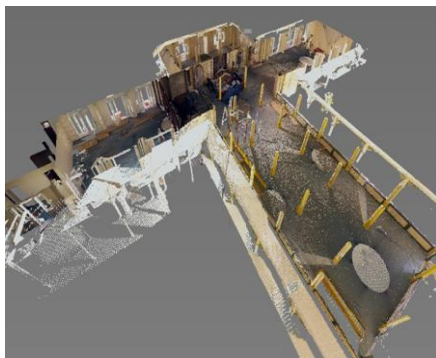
Cross-section of the building in point cloud (Authors, 2019)
